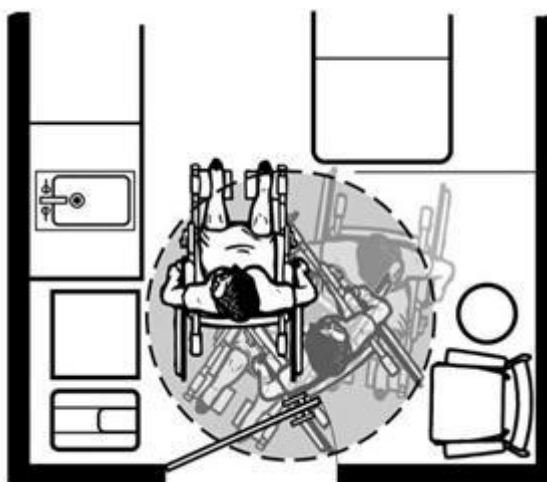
Plan view of part of an examination room showing clear floor space for turning a wheelchair. This space can also make it possible for the lift
